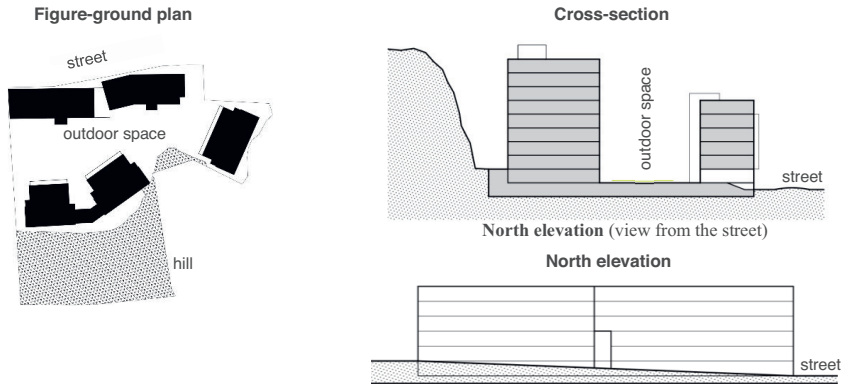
Example of variation of podium type with the lowest storey partly under the ground/above street level – plan drawings (within zoning plan limits), section showing built and outdoor spaces relative to the surrounding street, and north elevation – view from the street; located in Ekebergveien street 5 A–E
